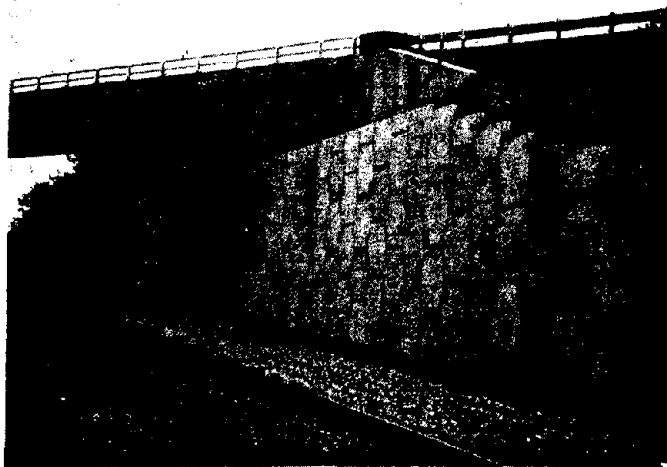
Reinforced earth supported embankment that serves as foundation for abutments of railroad bridge at Wells, Maine.
